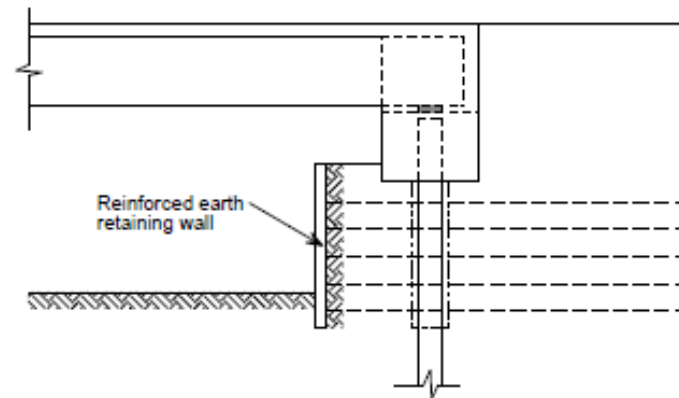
Framed abutment – with reinforced earth retaining wall
